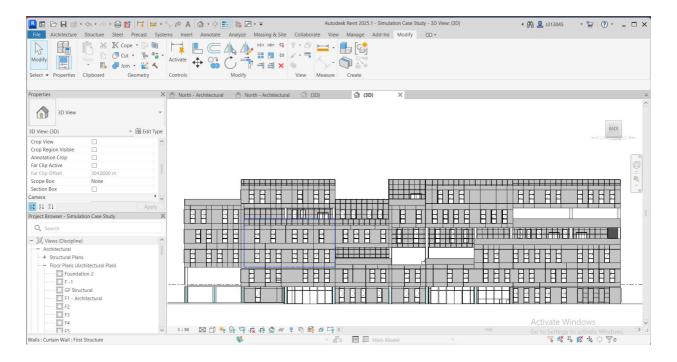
North Elevation in Revit after editing plans and 3d model, Elaborated by Authors
